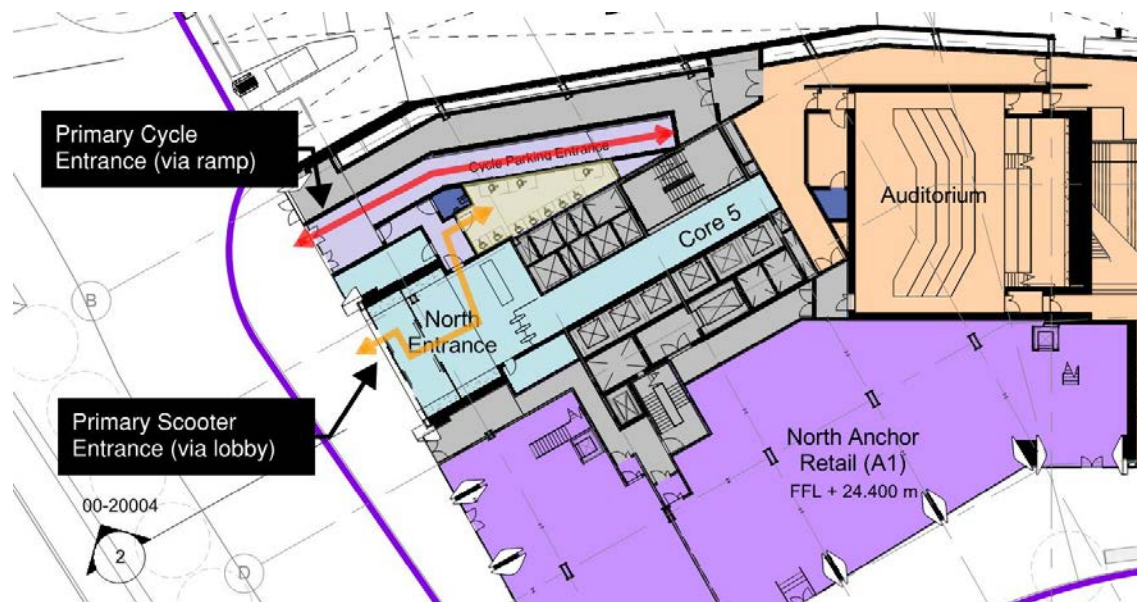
Plan showing access arrangements from Goods Way to the accessible cycle and scooter parking facilities on the mezzanine level below
